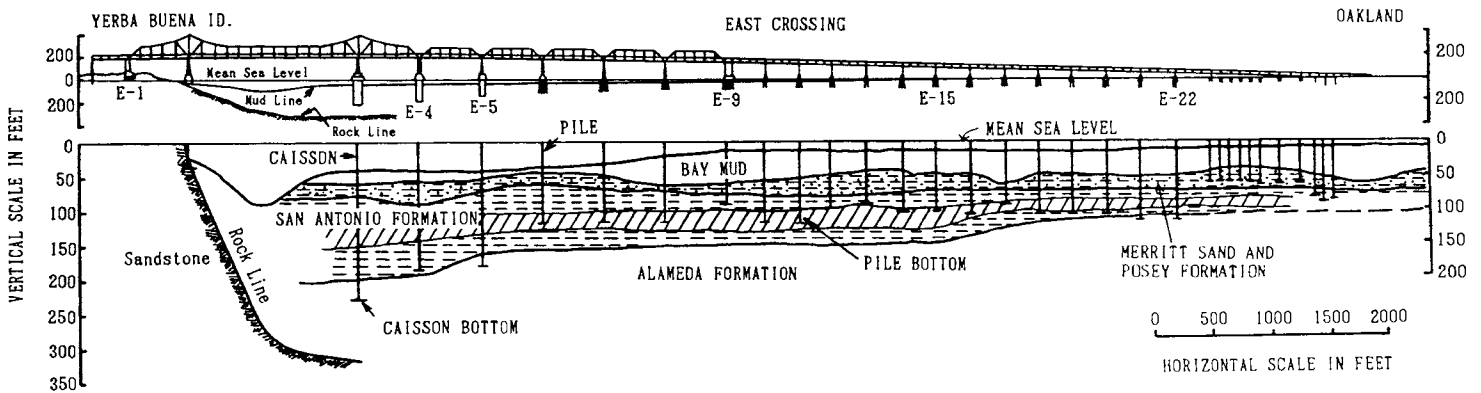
The San Francisco-Oakland Bay Bridge (revised original figure)<sup>3) 15) 16) 19)</sup>
